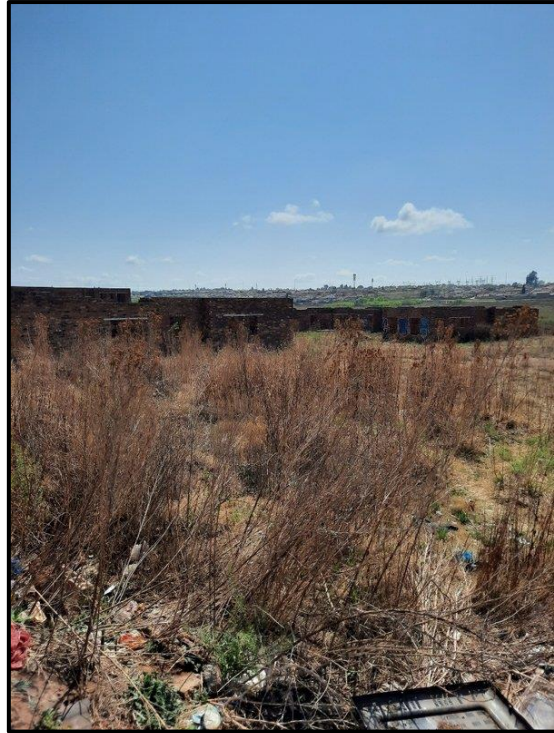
General site conditions - Southern section of the proposed project area facing north along the unfinished development.
